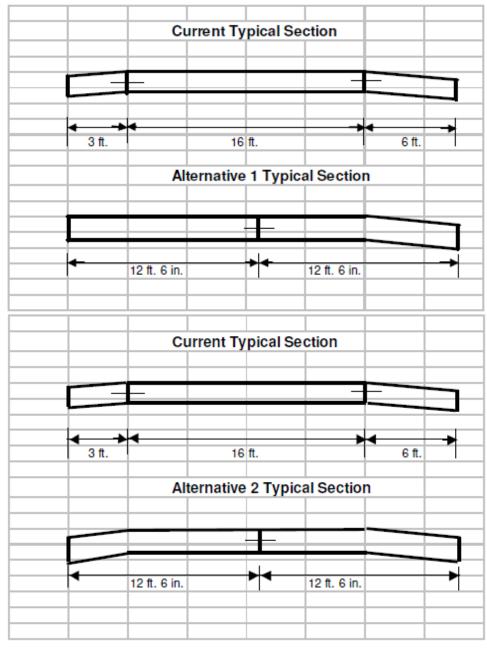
Alternatives concrete pavement sections recommended by ODOT
